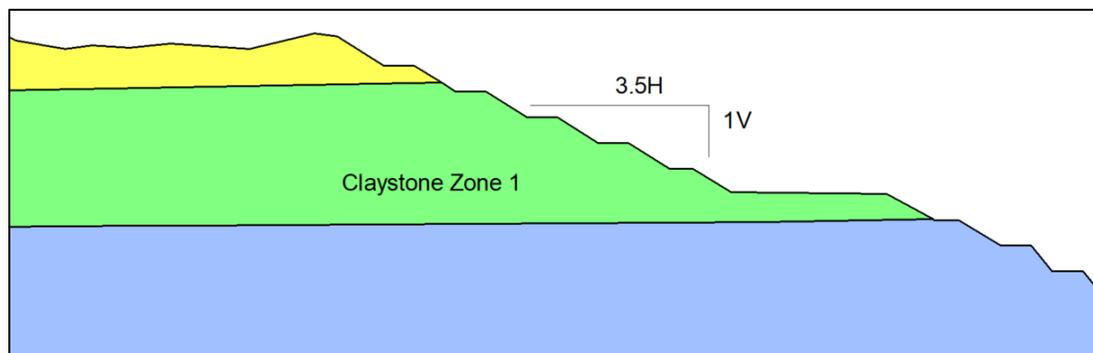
General Pit Stability Cross Section C (Source: GRE, 2023)
